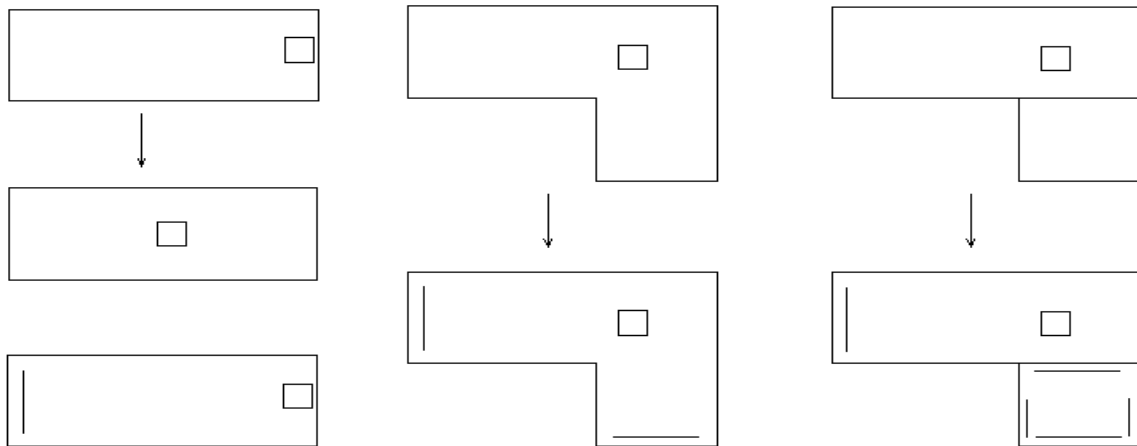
Structural Walls in plan (source: Anwar. A., & Yahyah. M. Q., 2009)
